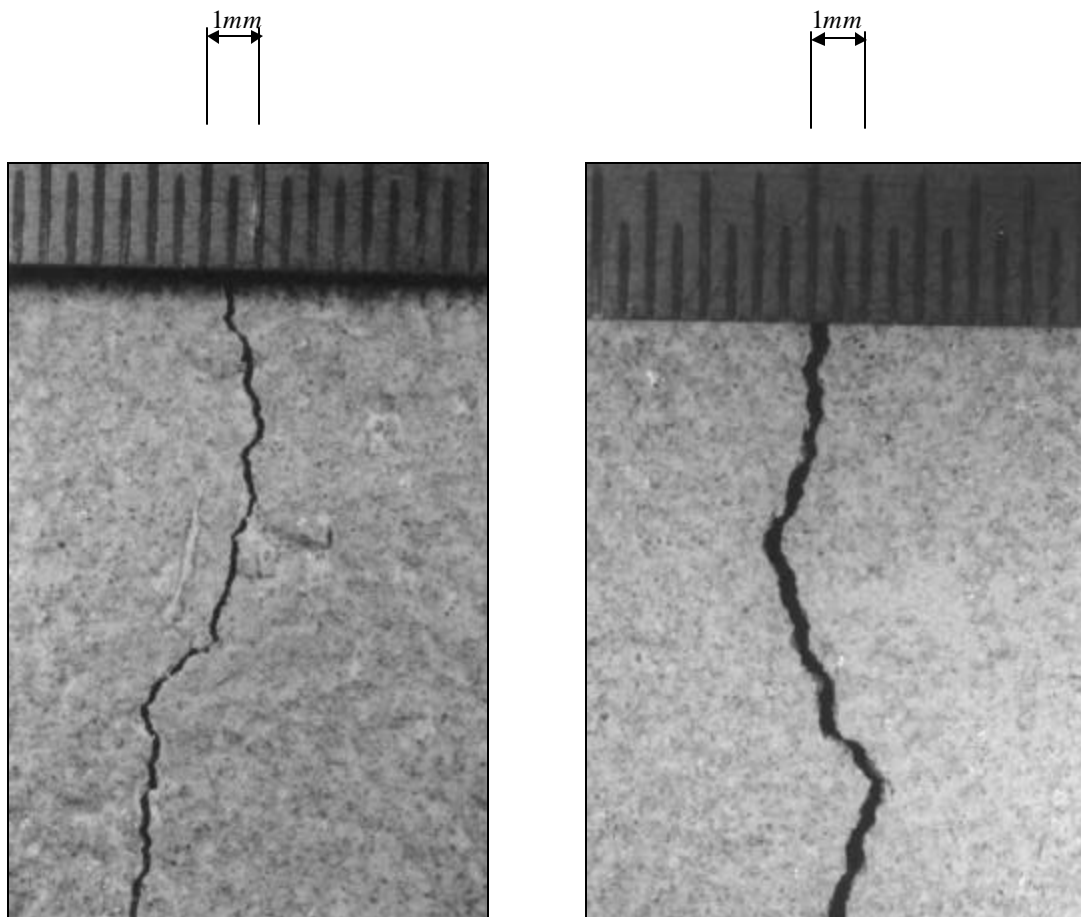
(a) Small crack in fibre reinforced sample      Fig. 5.19(b) Large crack in fibre reinforced specimen
